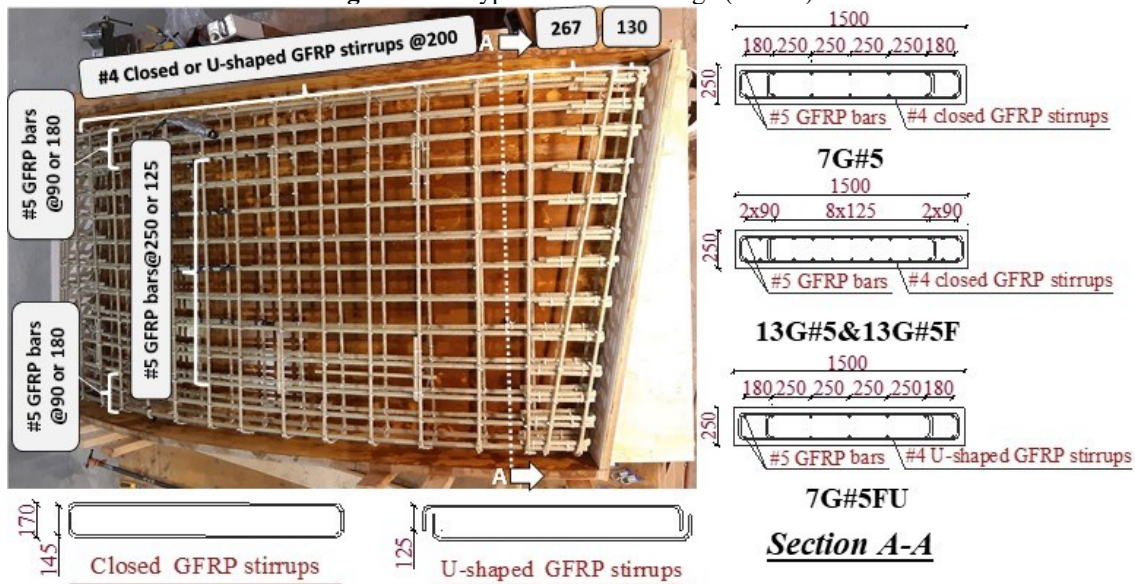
Reinforcement details of the specimens (dimensions in mm).
